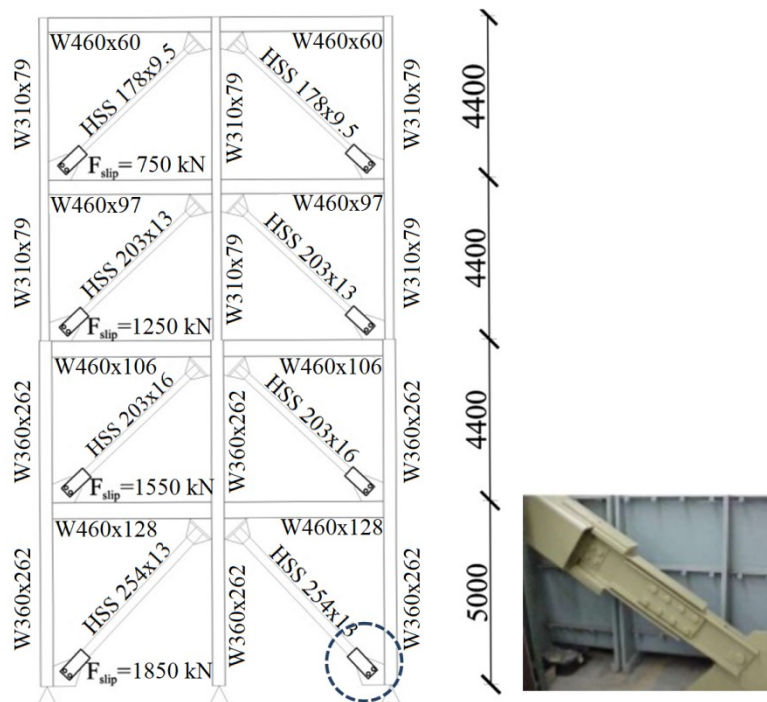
Elevation view of FS-BF system (E-W direction): a) elevation, slip force and designed member cross-sections and b) Detail of Pall Friction damper
